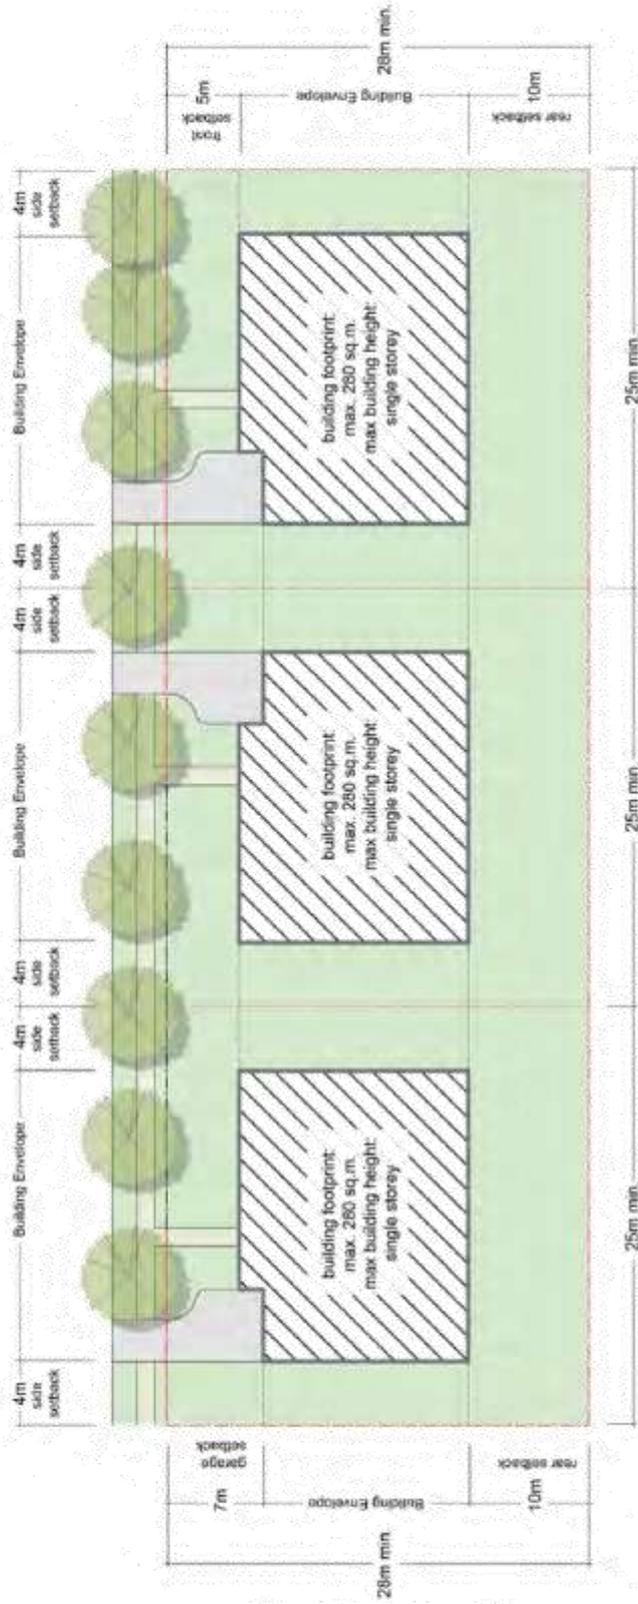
Indicative subdivision layout in the very low density area surrounding Oran Park House
